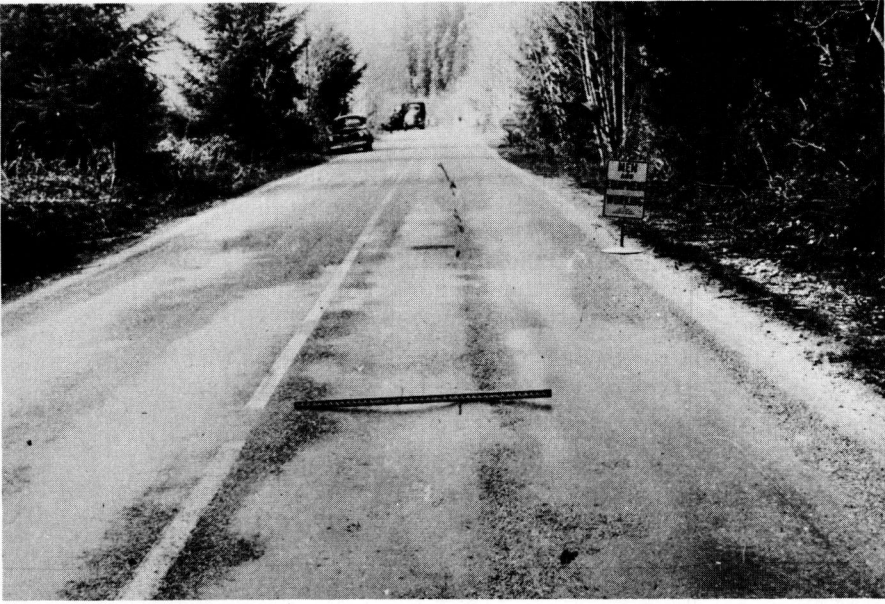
Shrinkage cracks in a sheet asphalt pavement characteristic of mixtures containing a relatively high content of low penetration asphalt and subject to little or no traffic.
